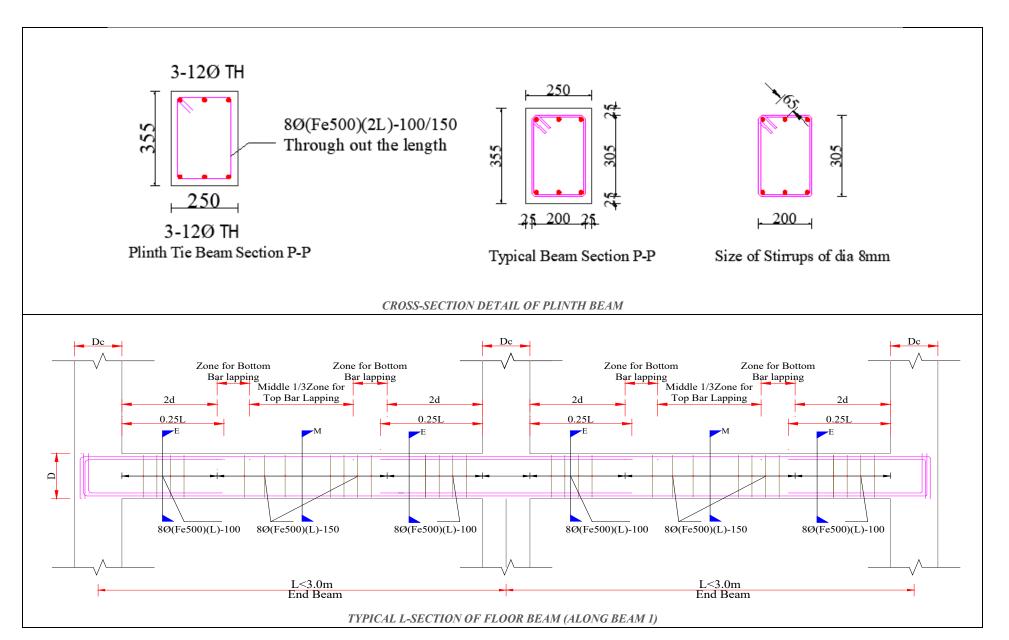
TYPICAL FLOOR BEAM DETAIL OF THREE STOREY BUILDING
